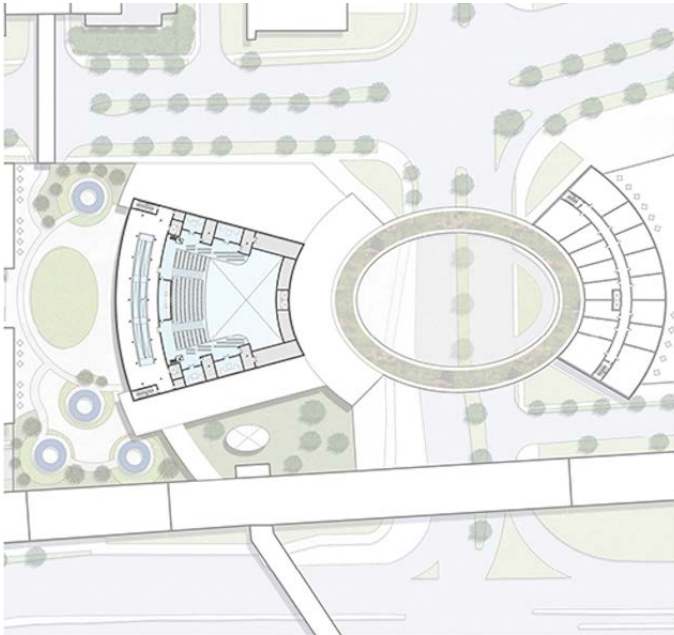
Fifth Floor Plan – Esports Arena Upper Level (Source: Jefferson Choi)
